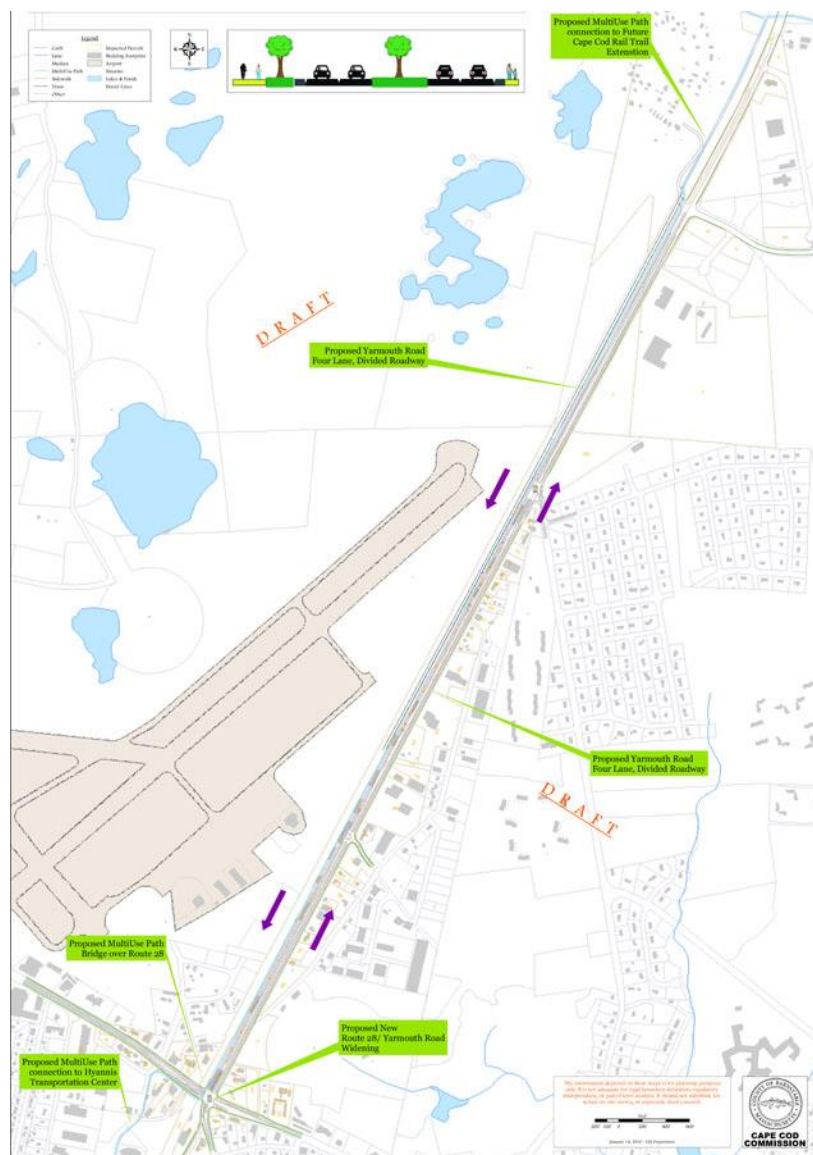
YARMOUTH ROAD RECOMMENDED CONCEPT PLAN
